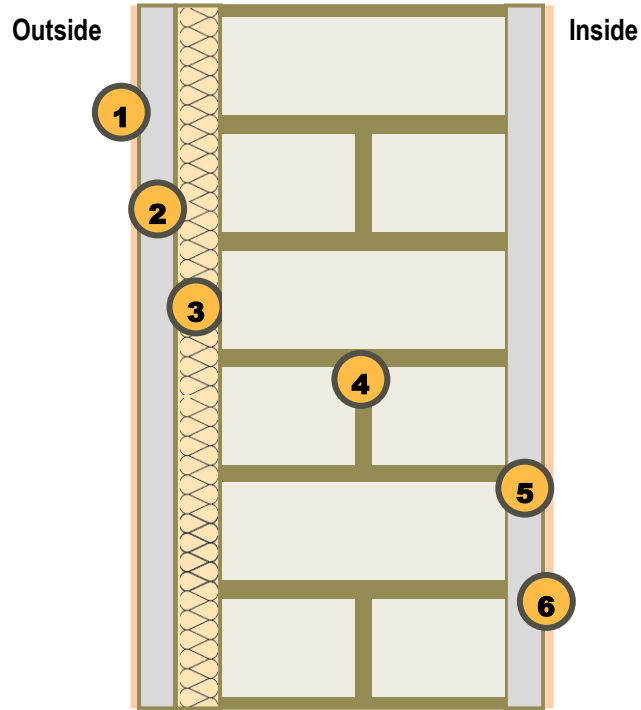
Construction detail for wall assembly: Fly-ash block with external insulation
